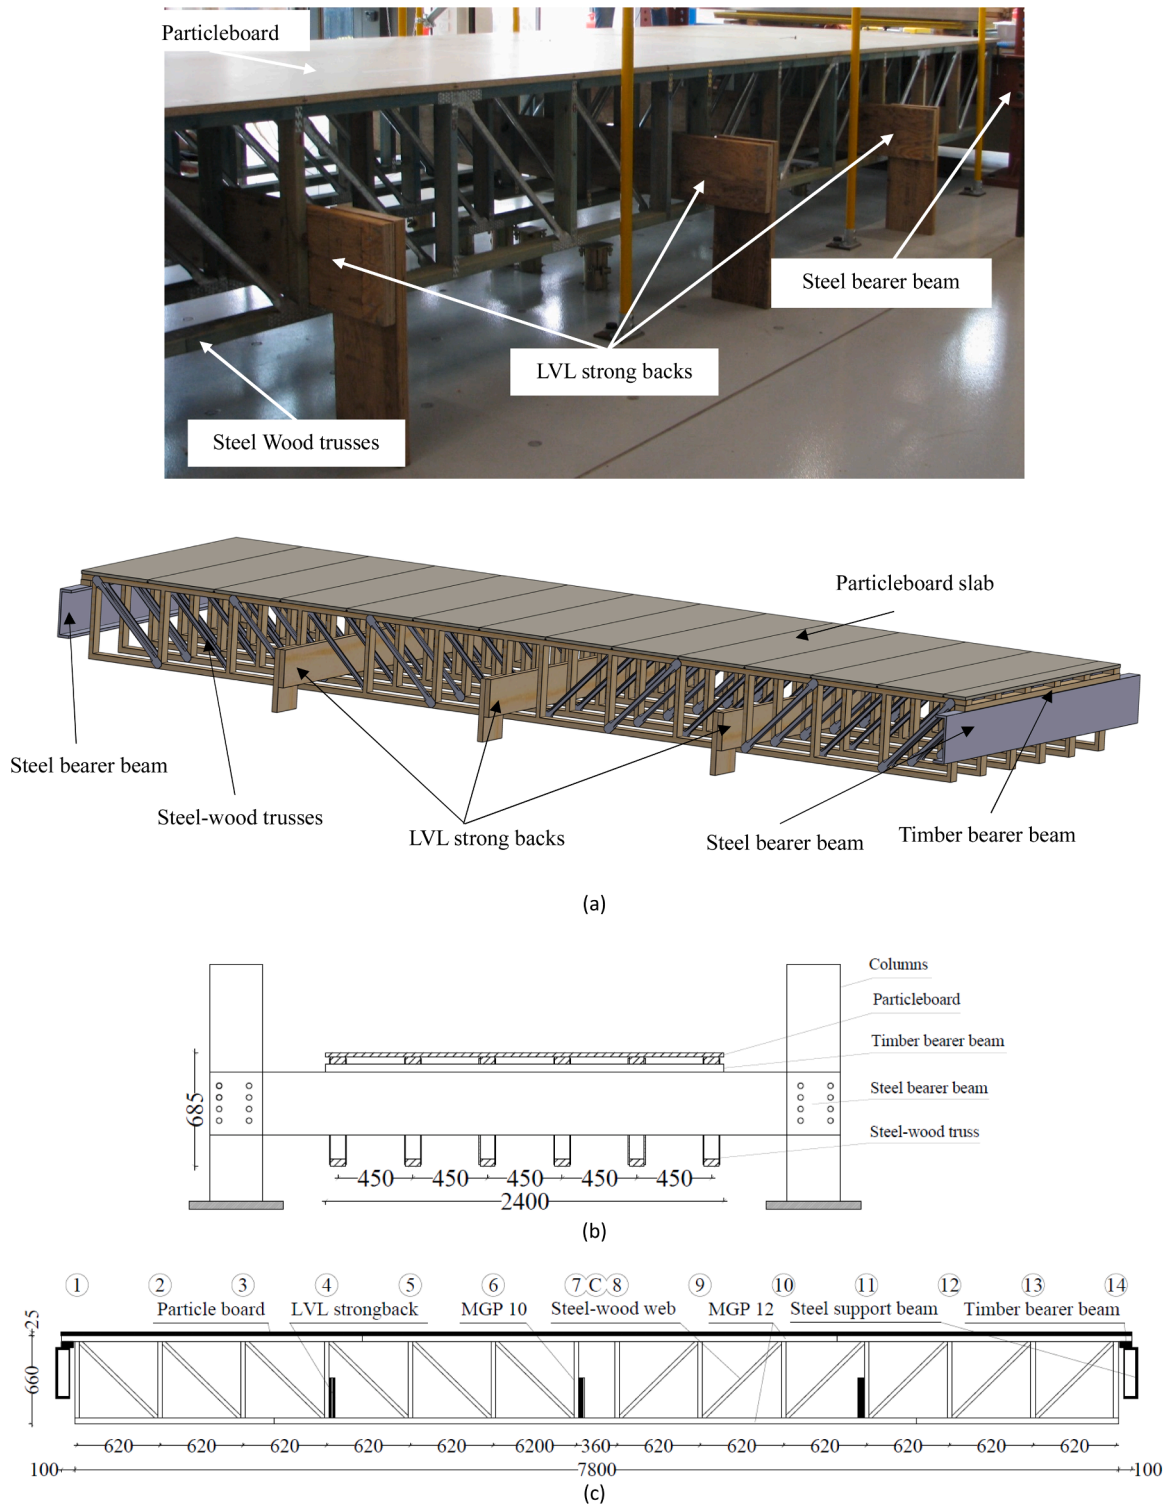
The simply supported LSTF floor system showing: (a) floor setup and its components, (b) front-rear elevation, (c) side elevation, all units are in mm.
